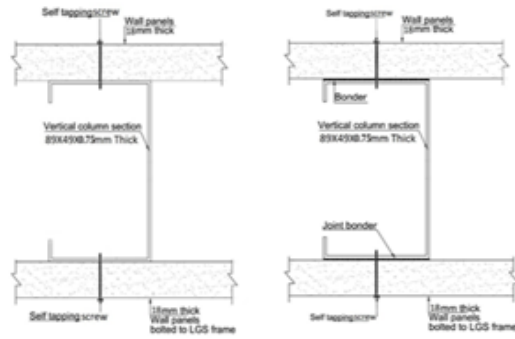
Connection with non-epoxy (NE) and connection with epoxy (E)
